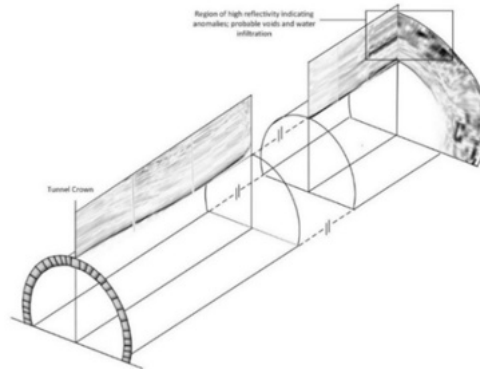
3D Cross section of Alfreton Old Tunnel, 2023
